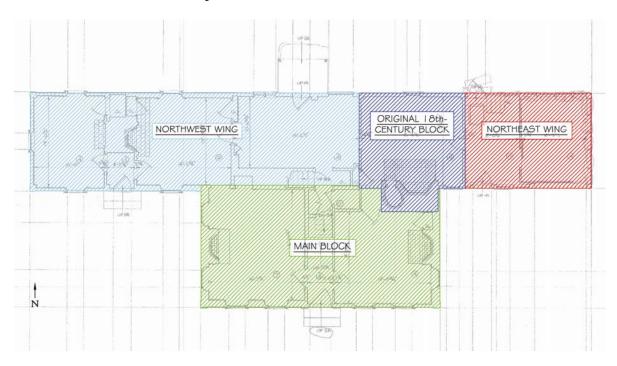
A-5. House Sections Key Plan, overlaid on HABS drawings (not to scale).
